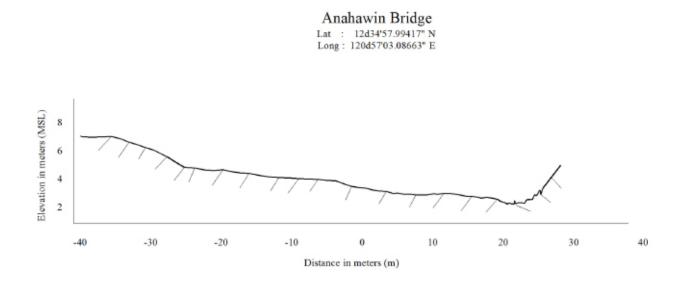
The upstream side of the Anahawin Bridge cross-section survey drawn to scale
